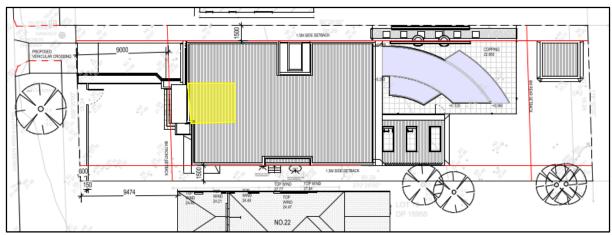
Site Plan of subject site showing general extent of void space as highlighted in vellow.
